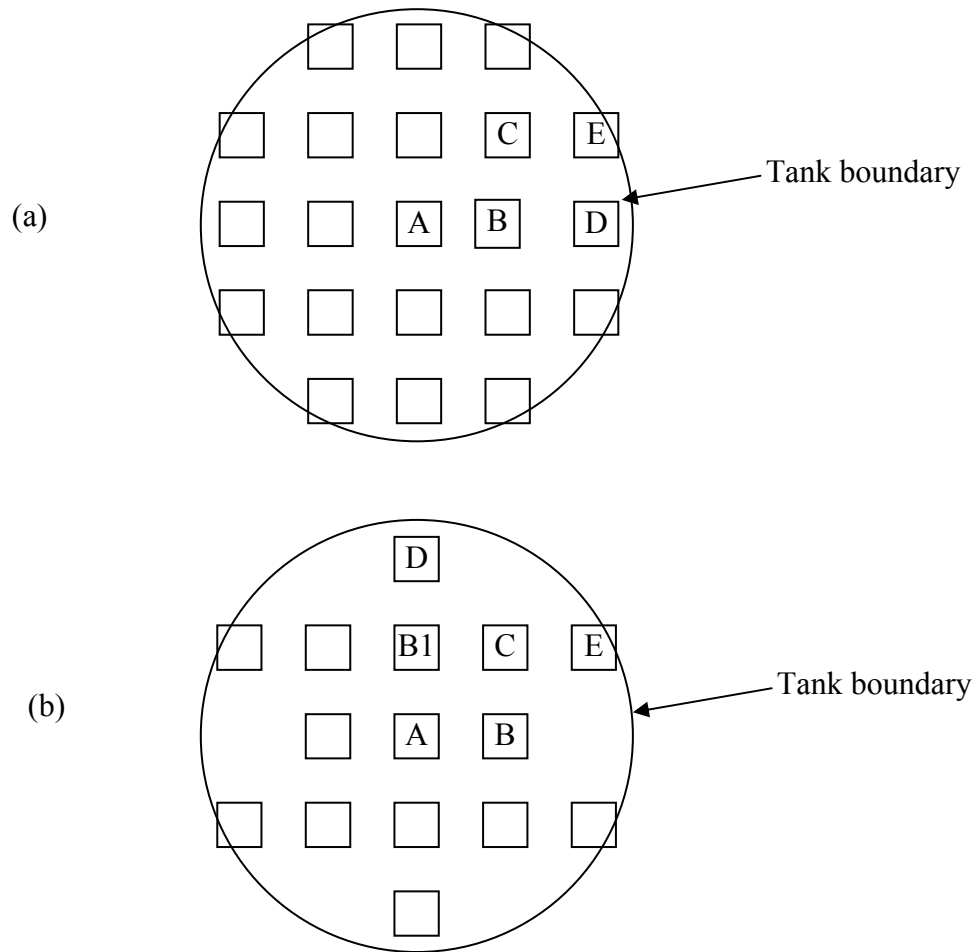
Configuration of pile plan layout (a) model test S2; (b) model test S3 (after S.C. Lee, 2004)
